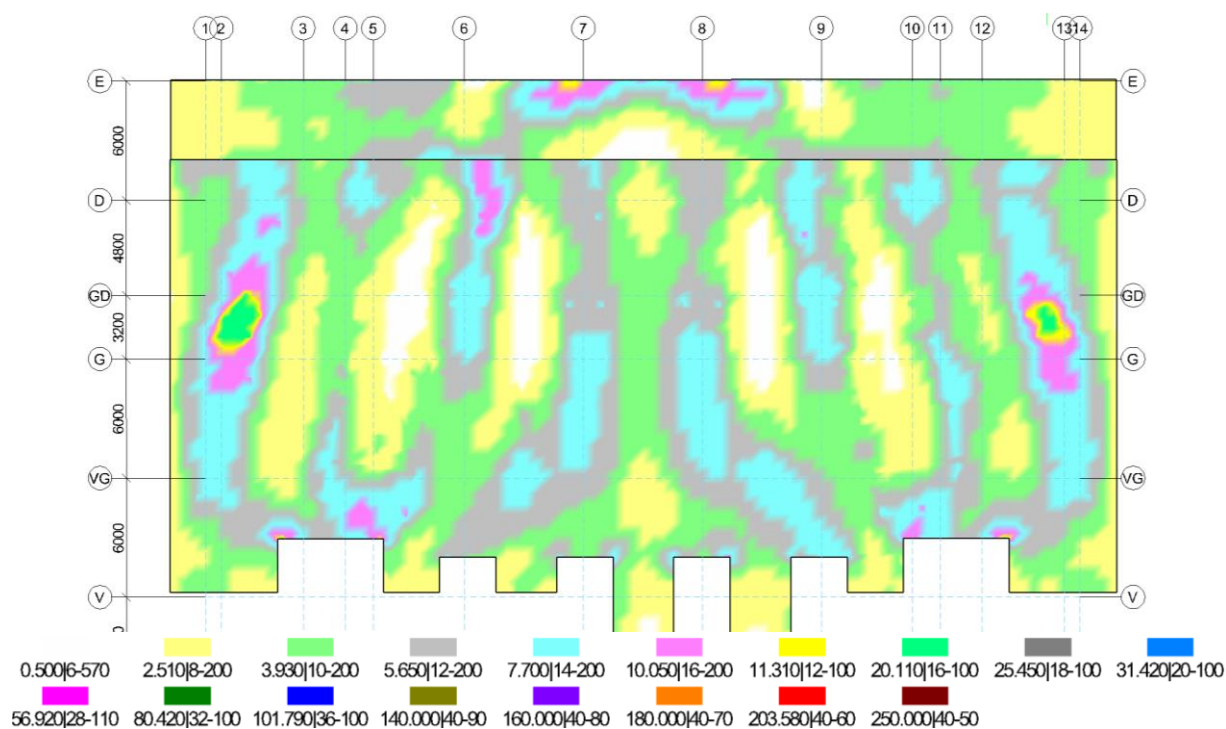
Reinforcement of the foundation. Upper longitudinal reinforcement in the direction of the axis S, cm^2/m [14]
